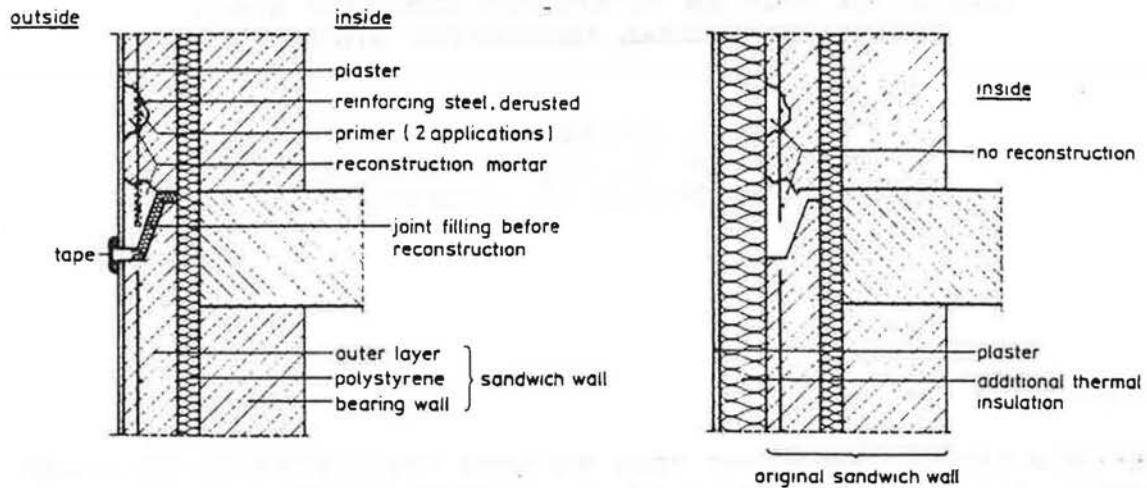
Thermal insulation instead of concrete repair: usual repair (left) and by a thermal insulation system (right) [1].
